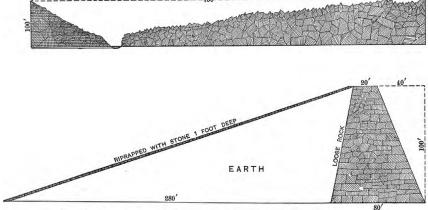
Cross sections of dam site and dam proposed on Grey Bull River.
